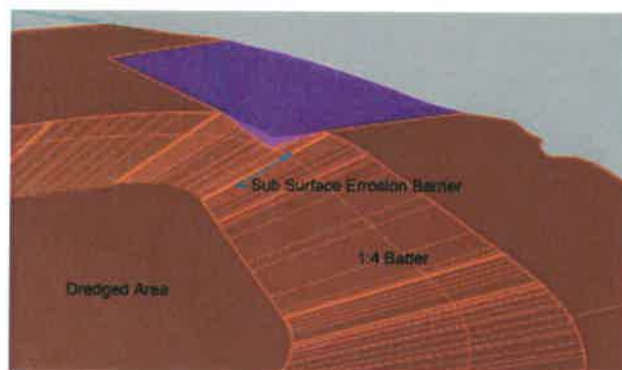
Sub Surface Erosion Barrier shown supporting shellfish bed
